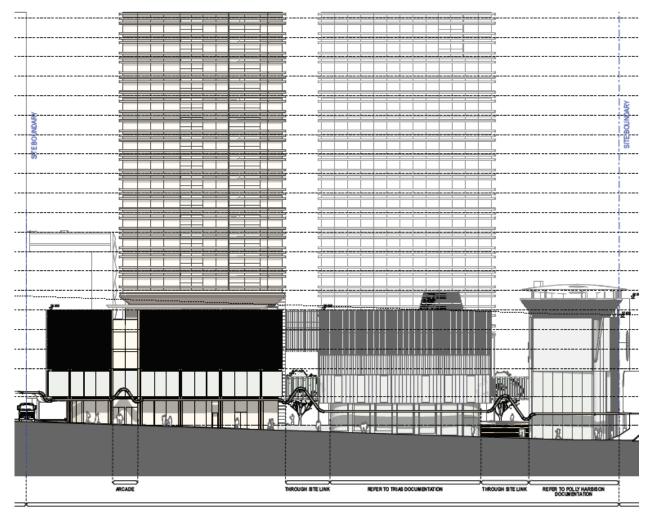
Extract of proposed plans – proposed Pitt Street elevation at podium level *Source: fjmt studio, 2019
